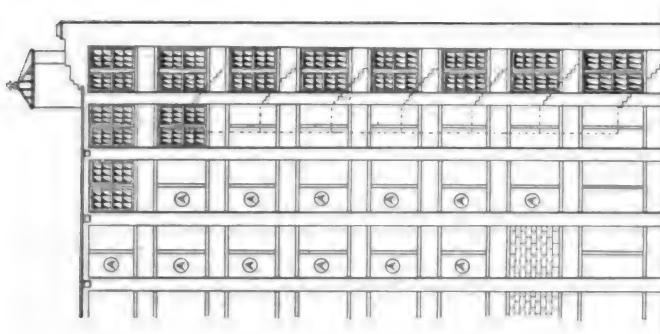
B.—Factory addition, Bradley Knitting Works, Delevan, Wis.
